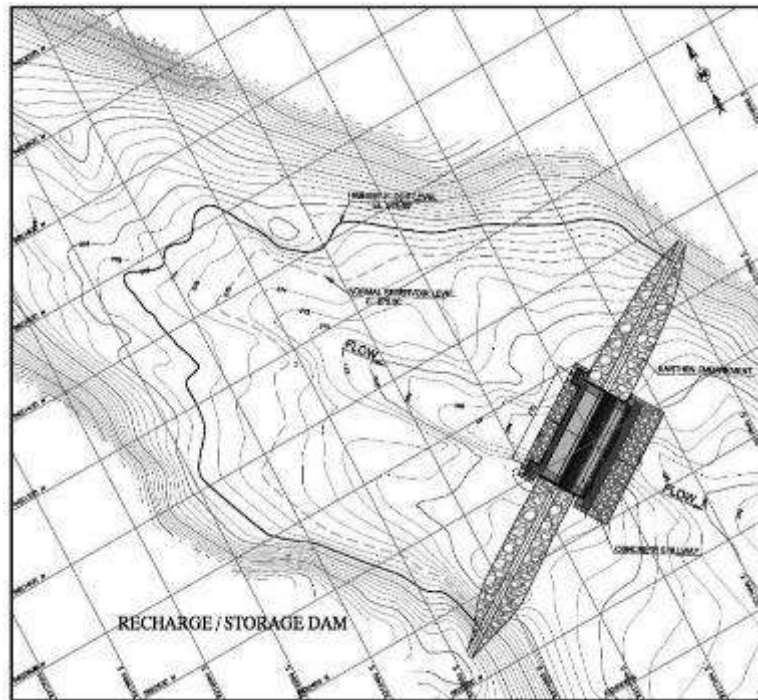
Recharge/Storage Dam with Earth Embankment and Concrete Spillway
